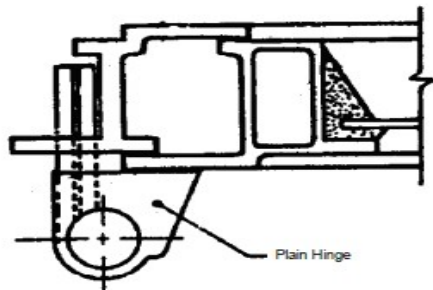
Typical Non-Projecting Type Hinge for Door
